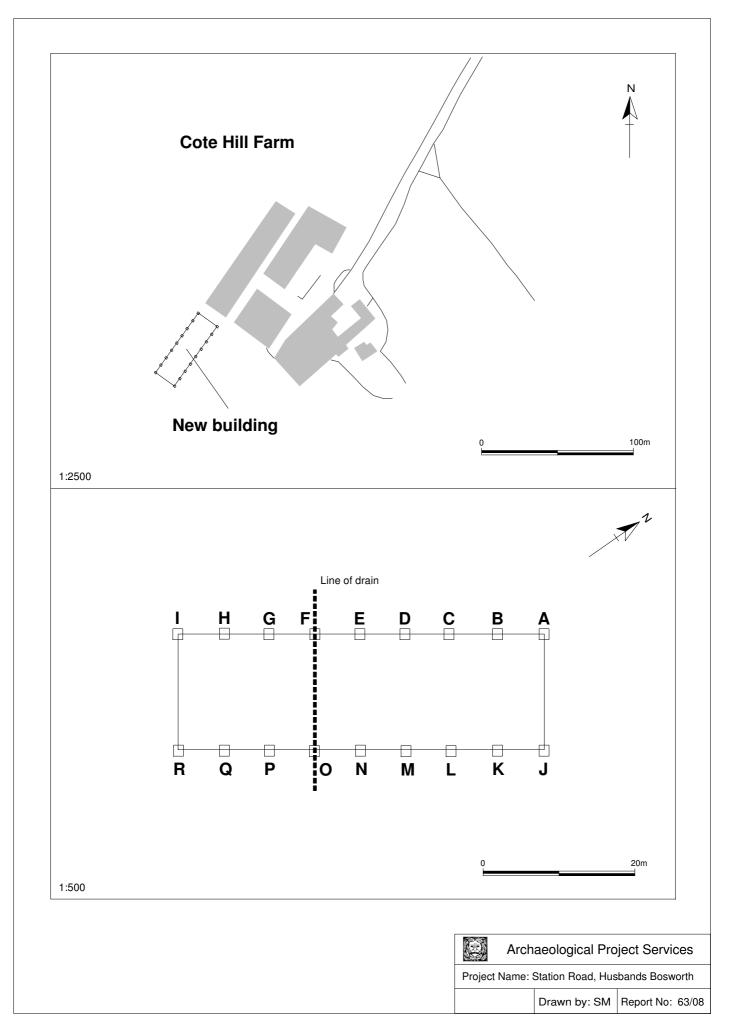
Location map showing position of new building and location of recorded stanchion pits
